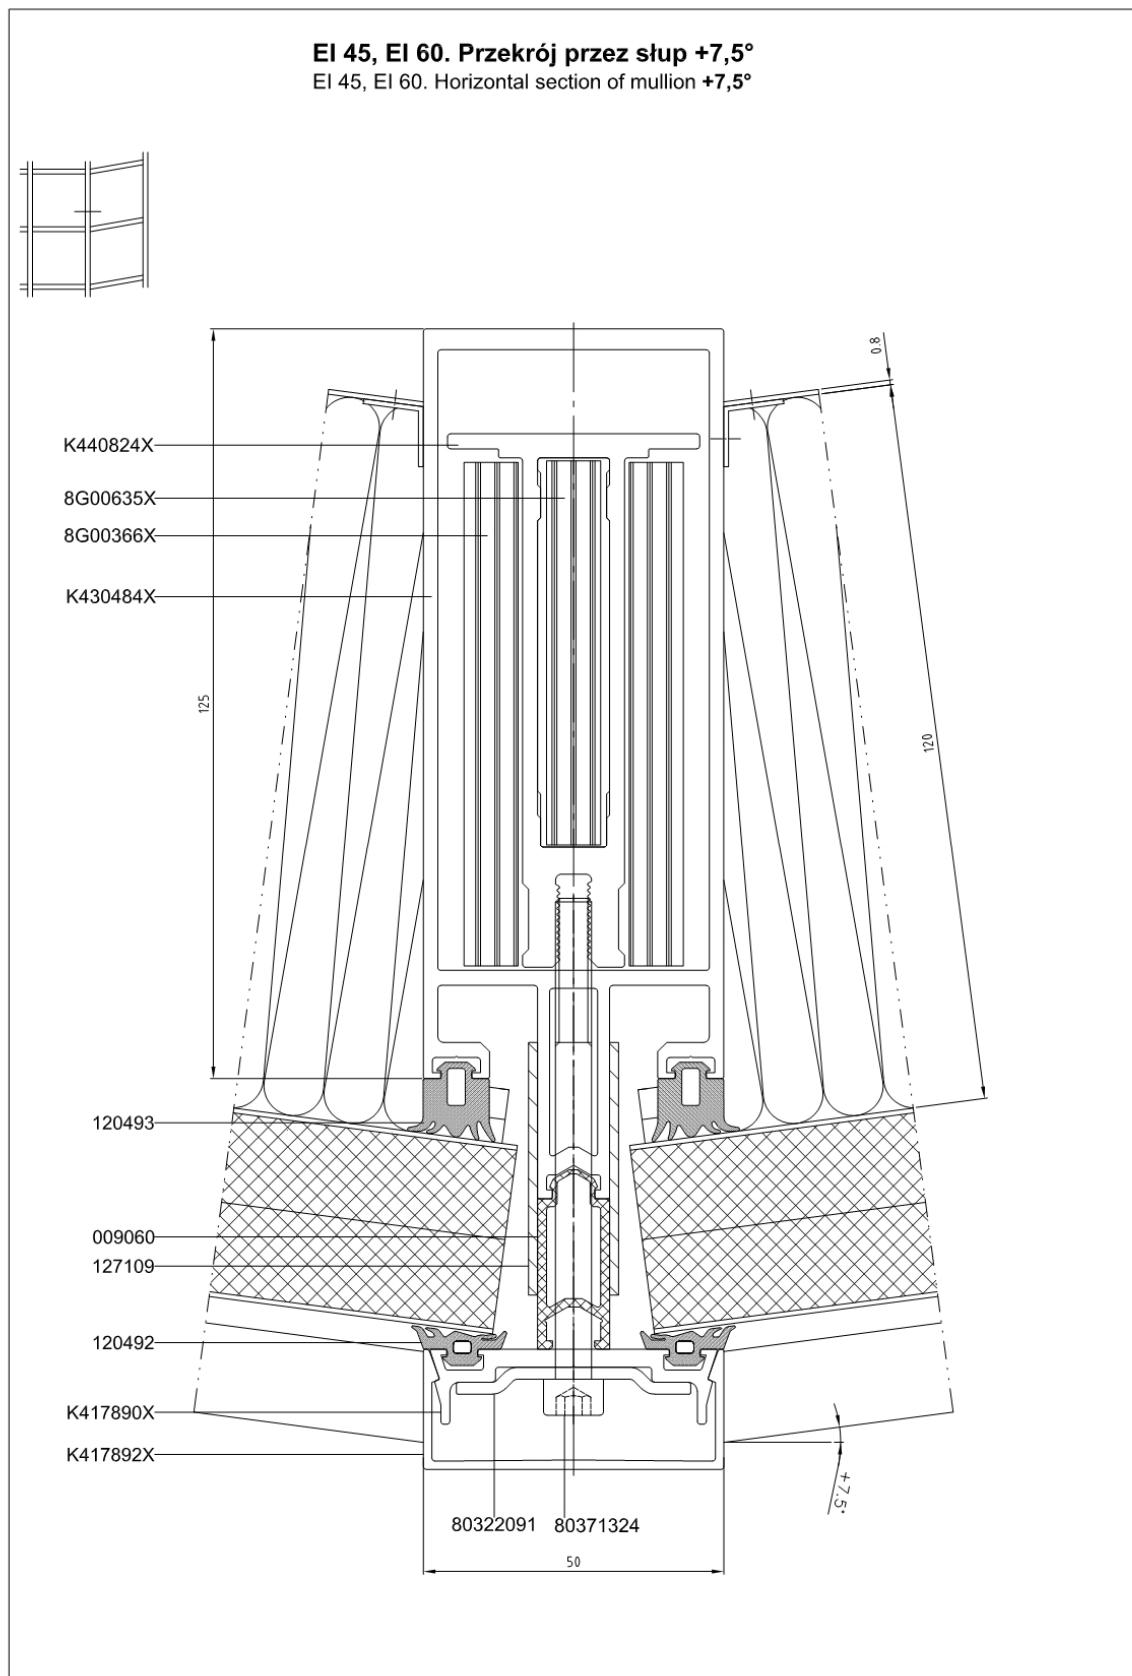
Cross-section through the typical MB-SR50N EI EI60 system mullion for small (up to 7.5 degrees) angles between adjacent curtain wall segments
